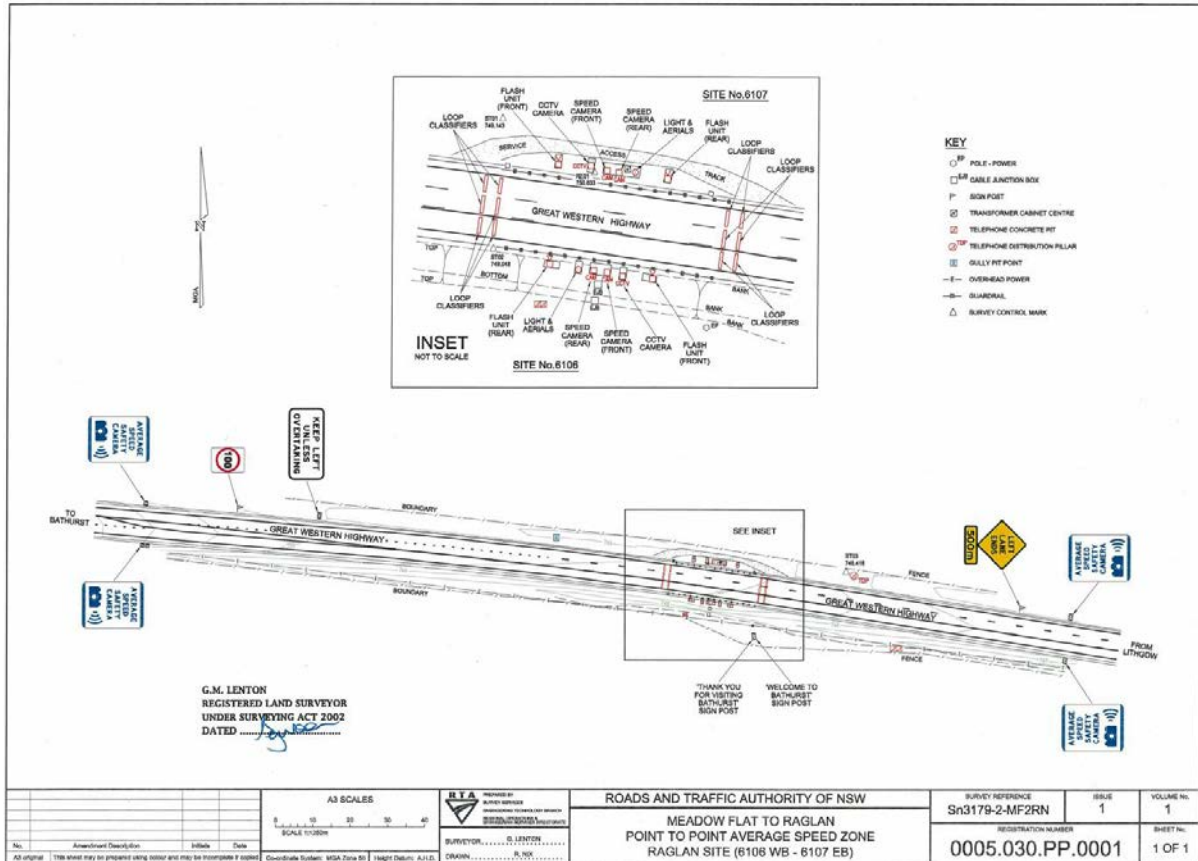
Detail survey plan for the Raglan site (Great Western Highway).
